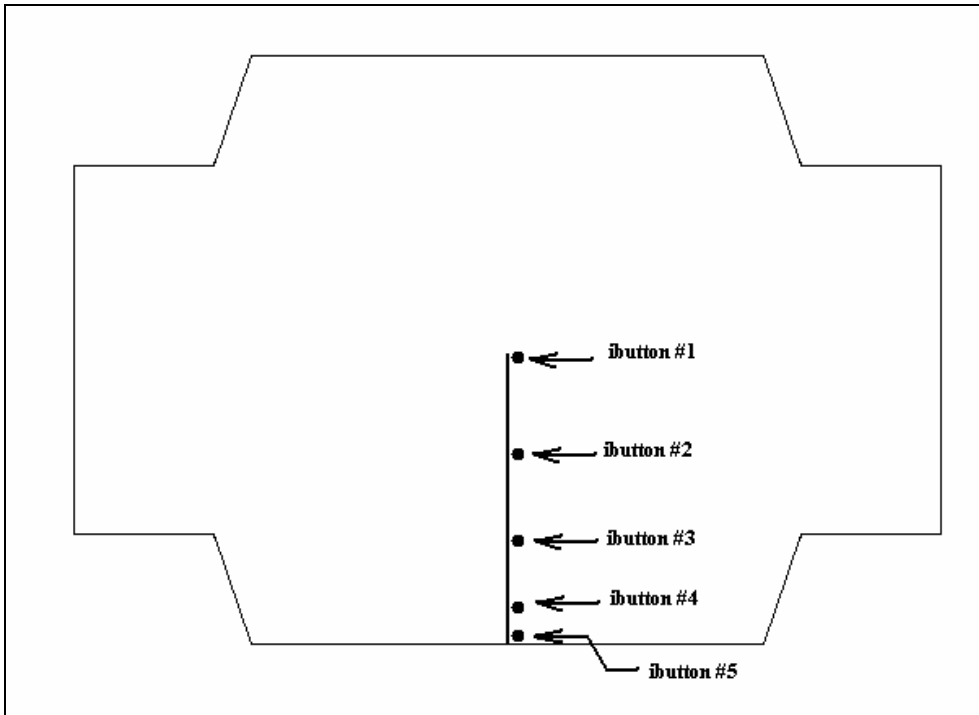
Plan view of column showing iButton run #2 layout (not to scale)
